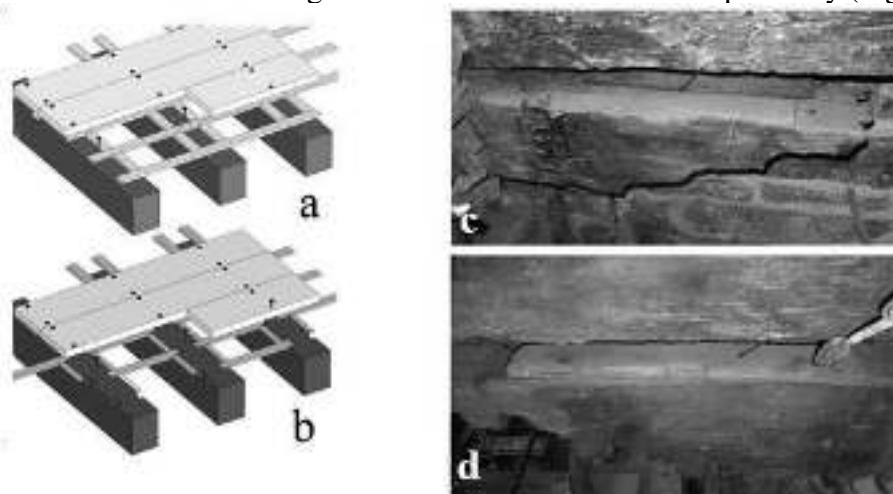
Left: The two ways of fastening *cantinelle* and the boarding of the “gothic venetian floor” according to Menichelli and Scappin: a. *Cantinelle* nailed onto beams, b. *Cantinelle* placed inside cut-out recesses. Right: Examining the *Cantinelle* remains on the surviving corbels. c. The 1st beam corbel d. the 12th one.
